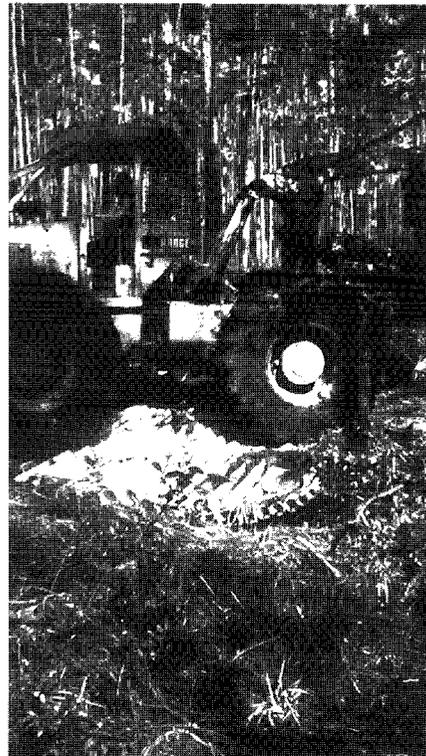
Skidding logs over a pipe mat geotextile installation.
